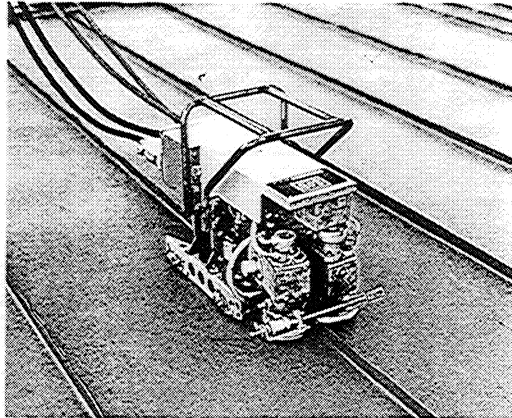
Welding Machine for Waterproof RCSS including Welder and Spot Welder
